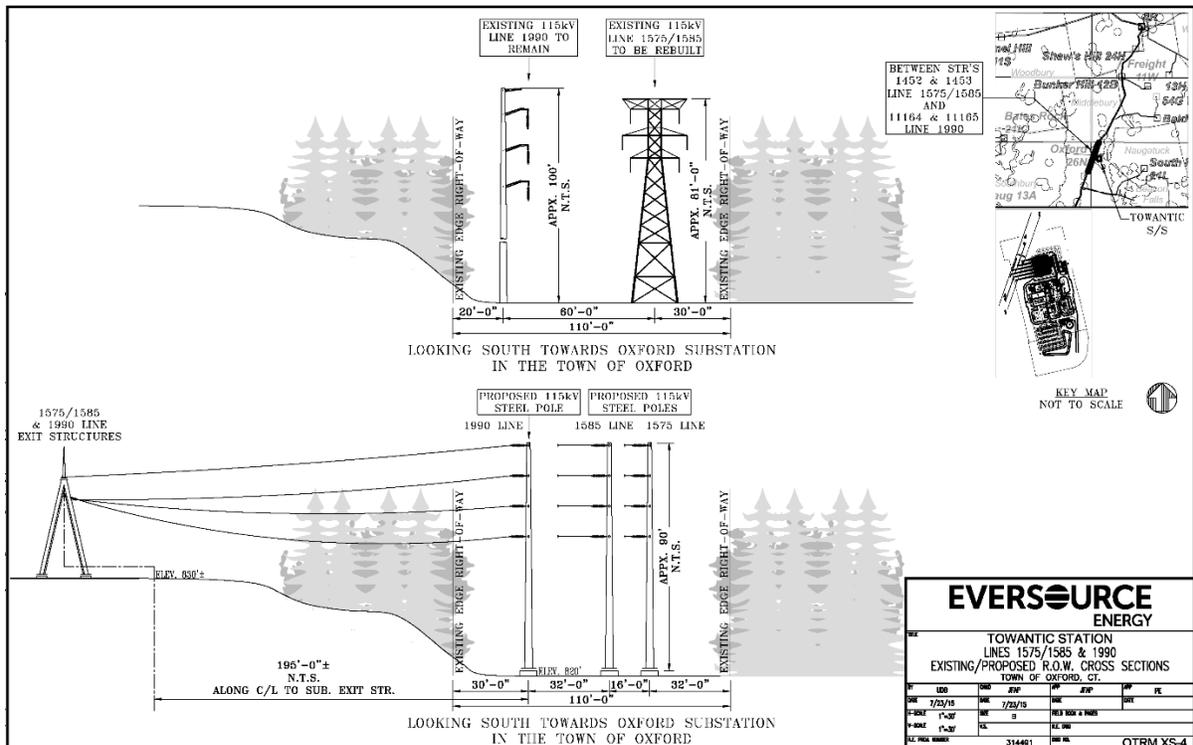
ROW at Towantic Switching Station Cross Sections – Existing & Proposed Structure Configurations: Facing South
